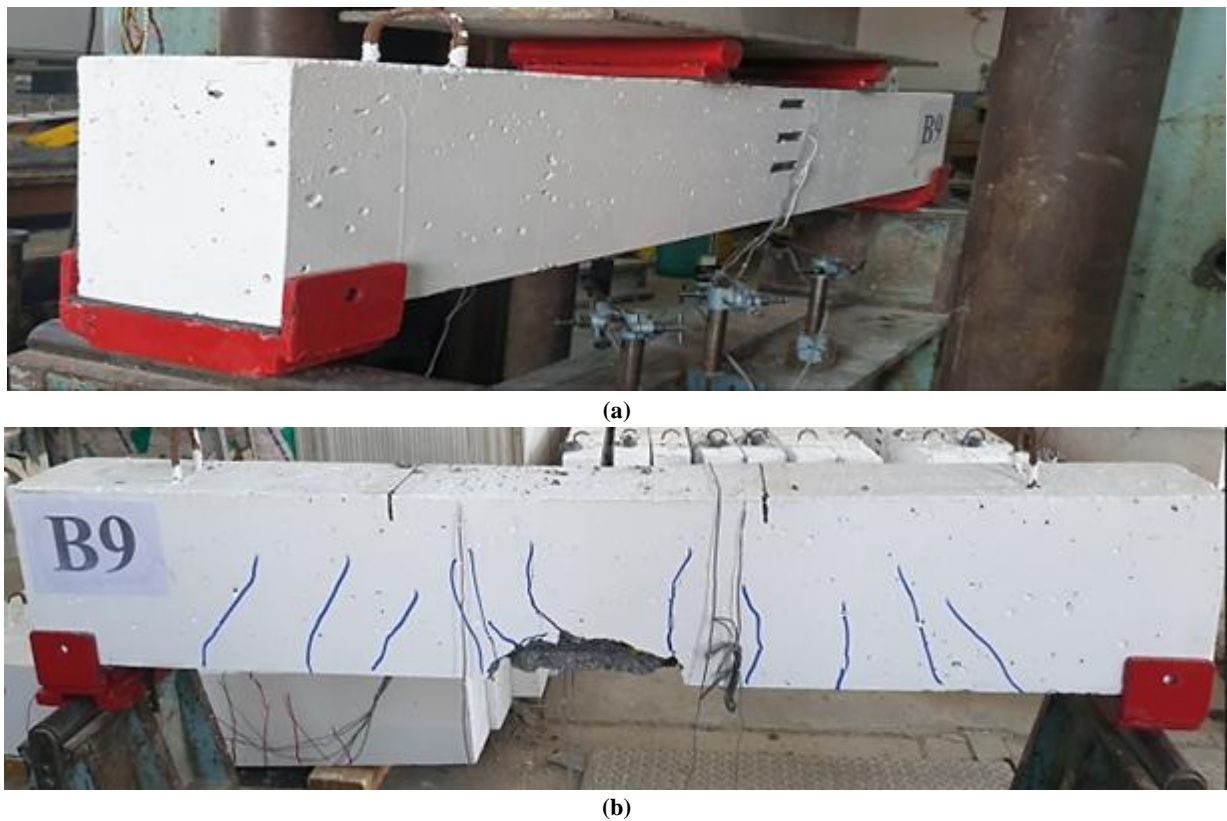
Test and failure pattern of beam B9 a) Beam B9 underloading b) Mode failure of beam B9
